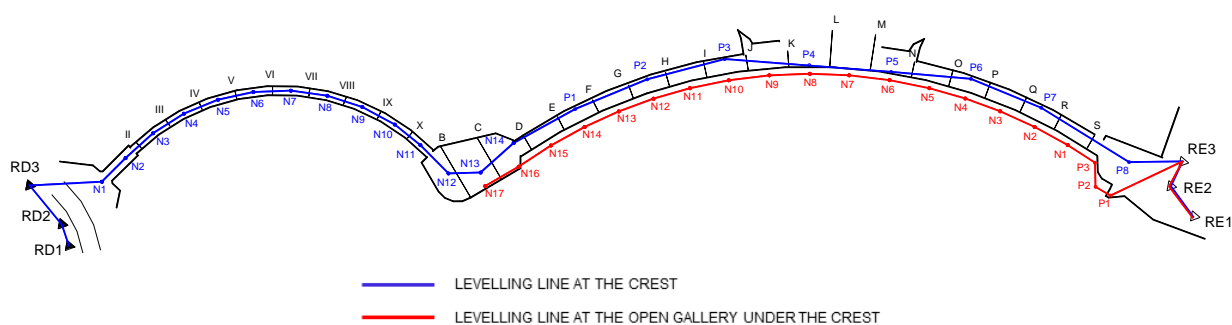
Plan of the two precision levelling lines installed on the open gallery under the crest of the main arch (elevation of 222.50 m) and on the crest of the secondary arch (elevation 225.00 m)
